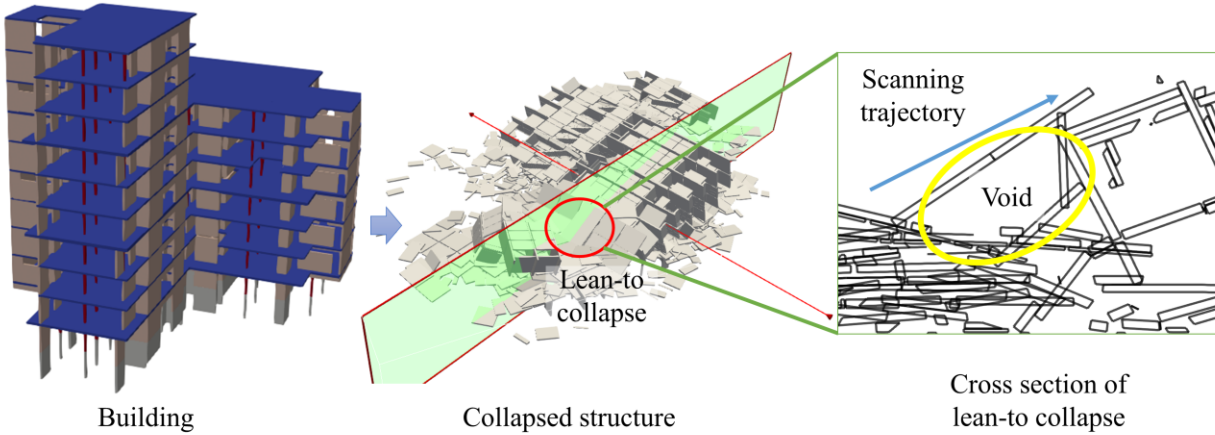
Simulated collapse structure and cross section of lean-to collapse void
